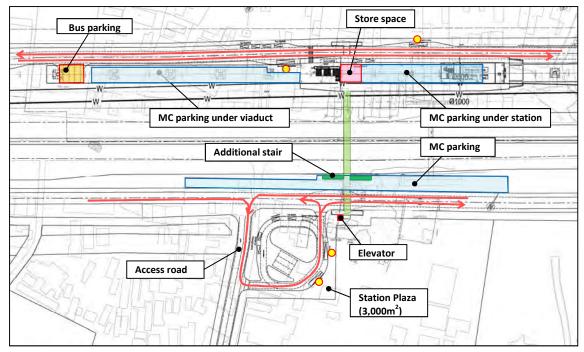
Concept Plan of the High-Tech Park Station Area
